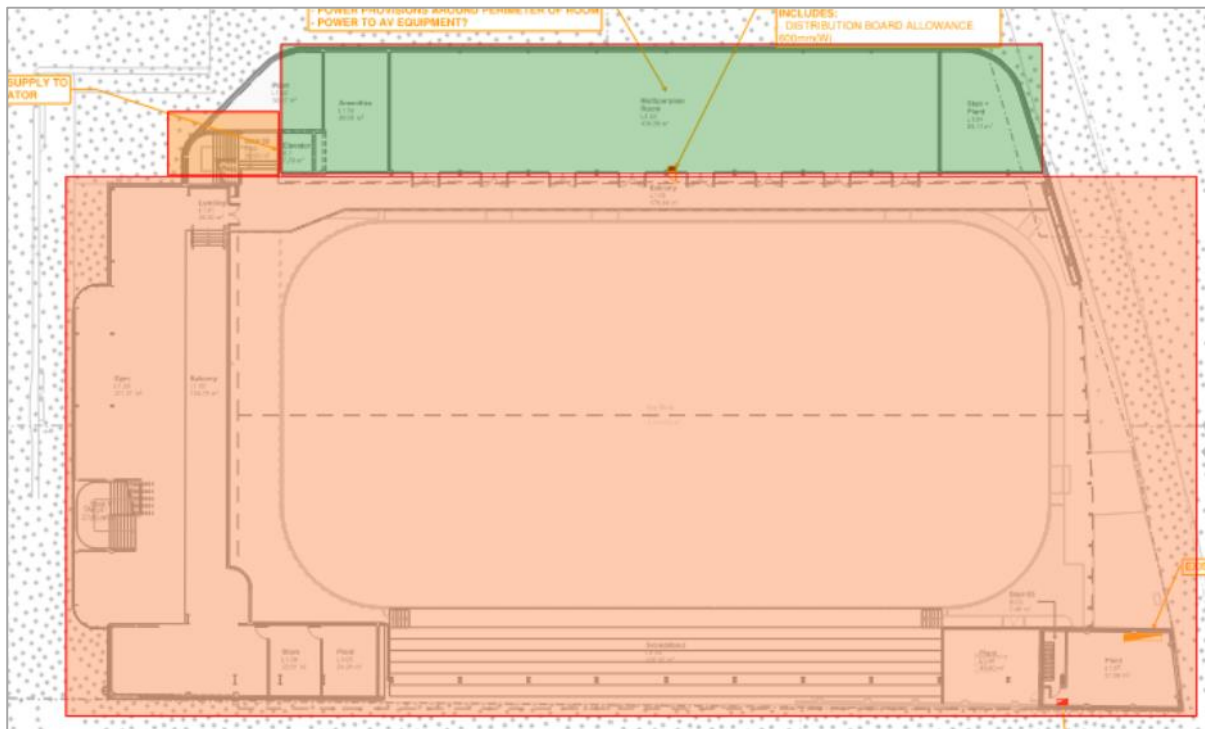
First floor with proposed expansion (in green) and existing spaces (in orange)
